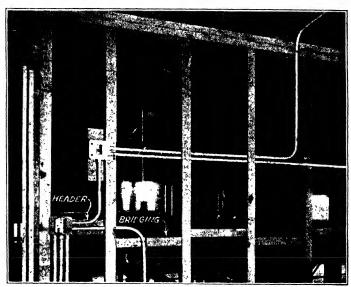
Installation of Thin-Wall Tubing in a Wood Studding
